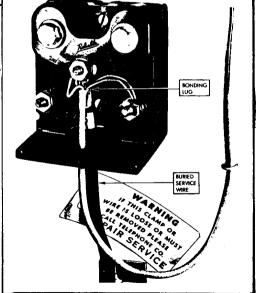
123 Type Protector Mounted on Wall (For Indoor Use Only)
